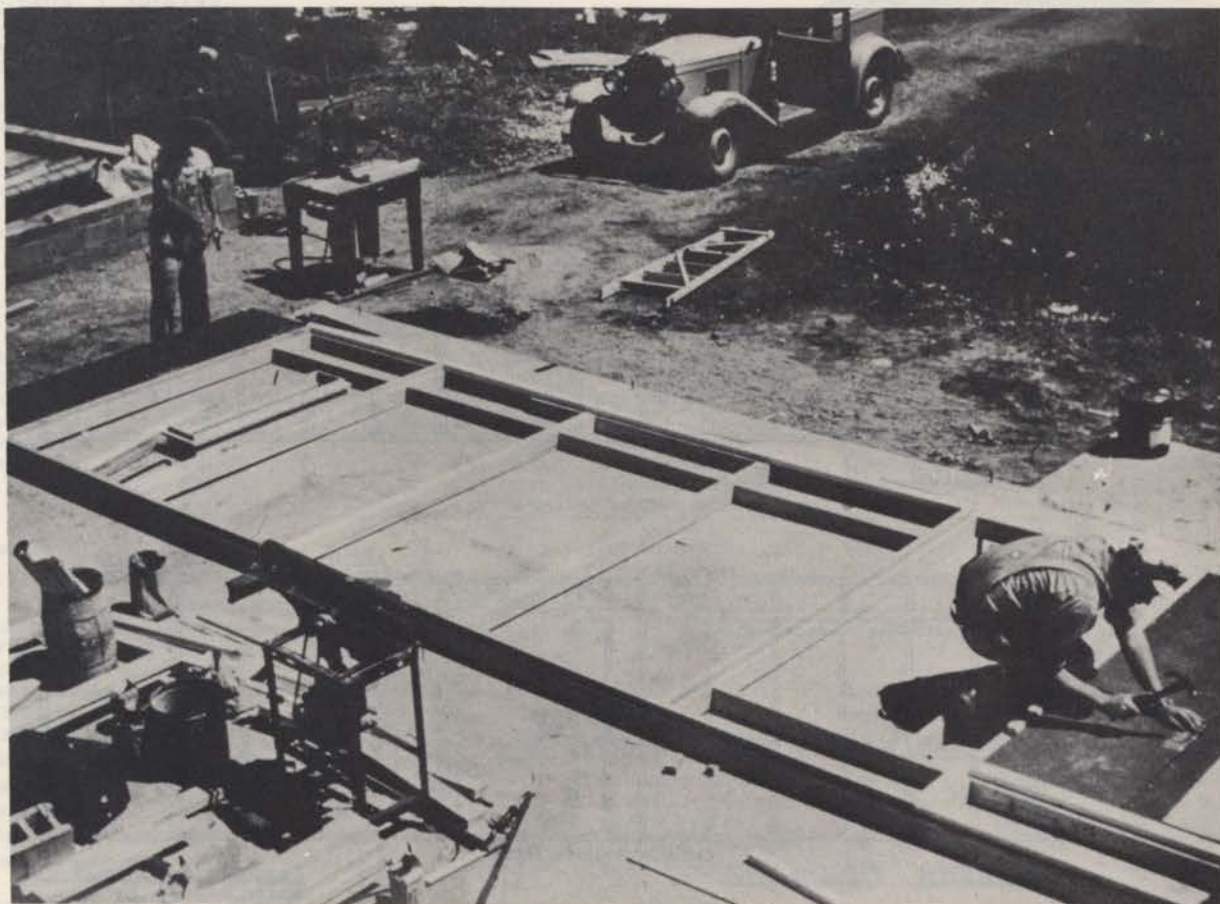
Exterior walls are fabricated on the floor slab.
